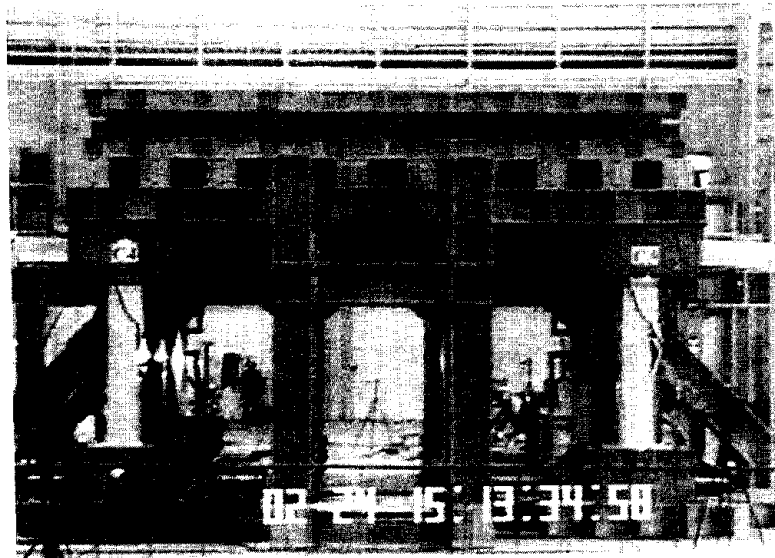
Shear Cracks at C3 and C4 Columns (B-Type, North Side)
